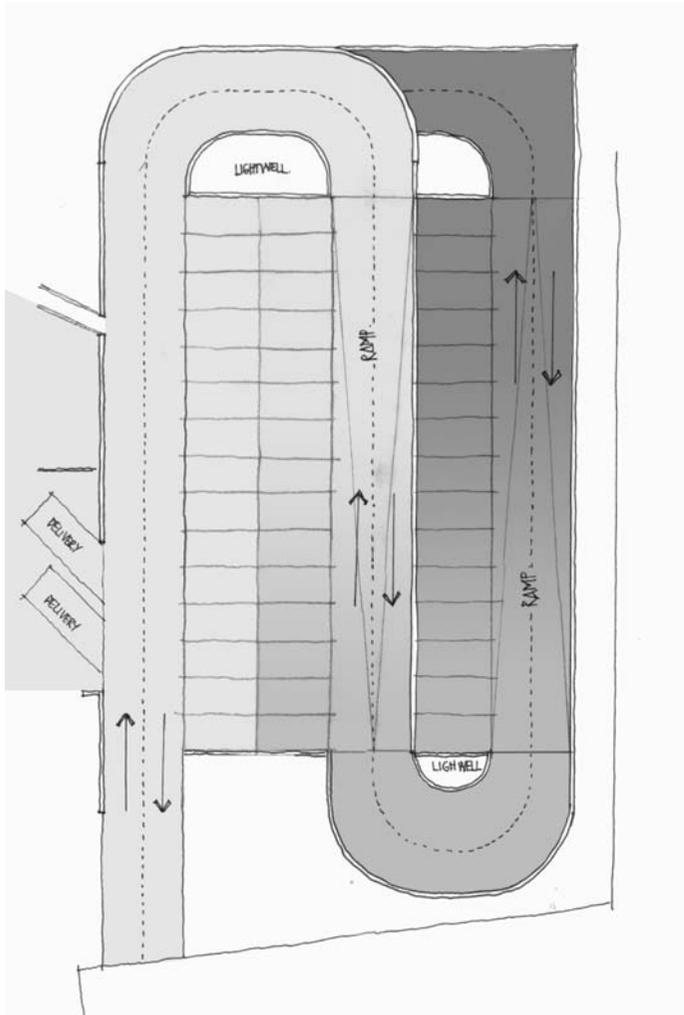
Idea for new ramp- and terraced basement parking garage
